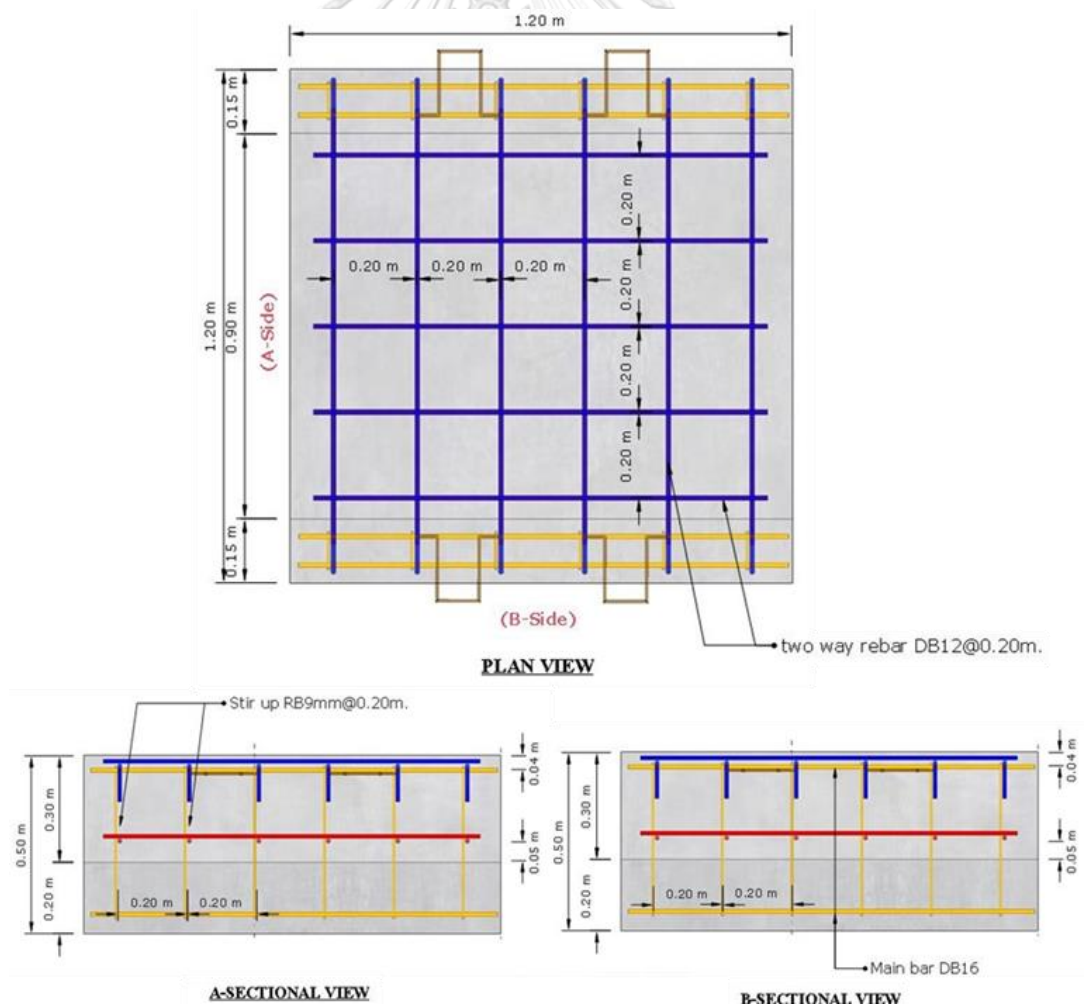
The designation of RC mock-up shows on plan and sectional views.
